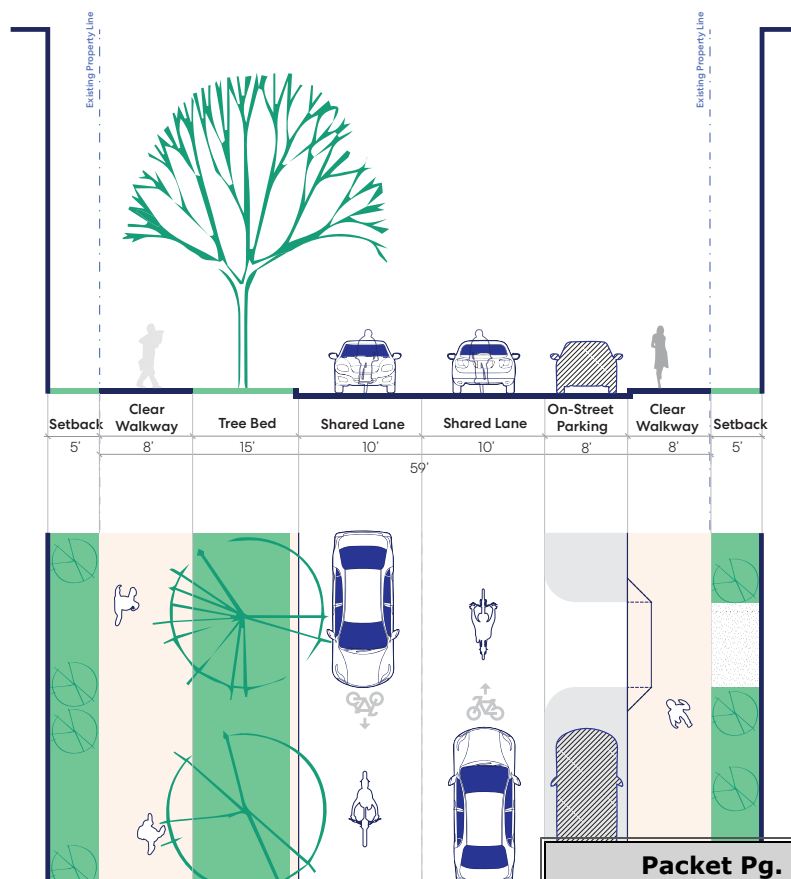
Typical Portage Avenue section between Park Boulevard and Ash Street
